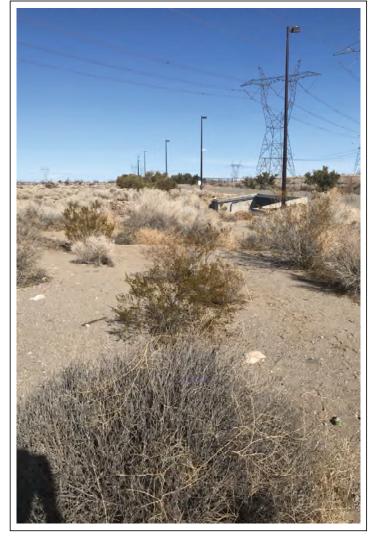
Photo K - View of the culvert that conveys Drainage 6 beneath Aster Road.
